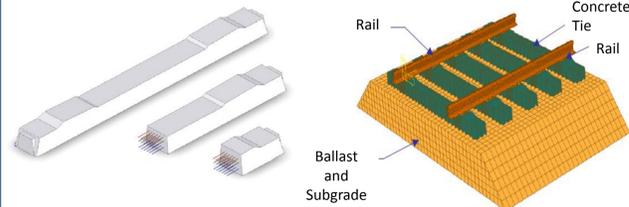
Concrete tie cross section (left) and railway cross section (right), (Kaewunruen, S. & Remennikov, A., 2000)
